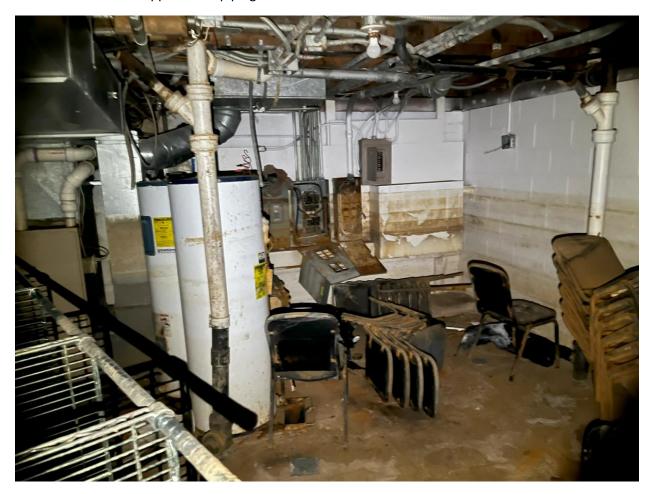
Basement showing water damage and signs of being flooded
